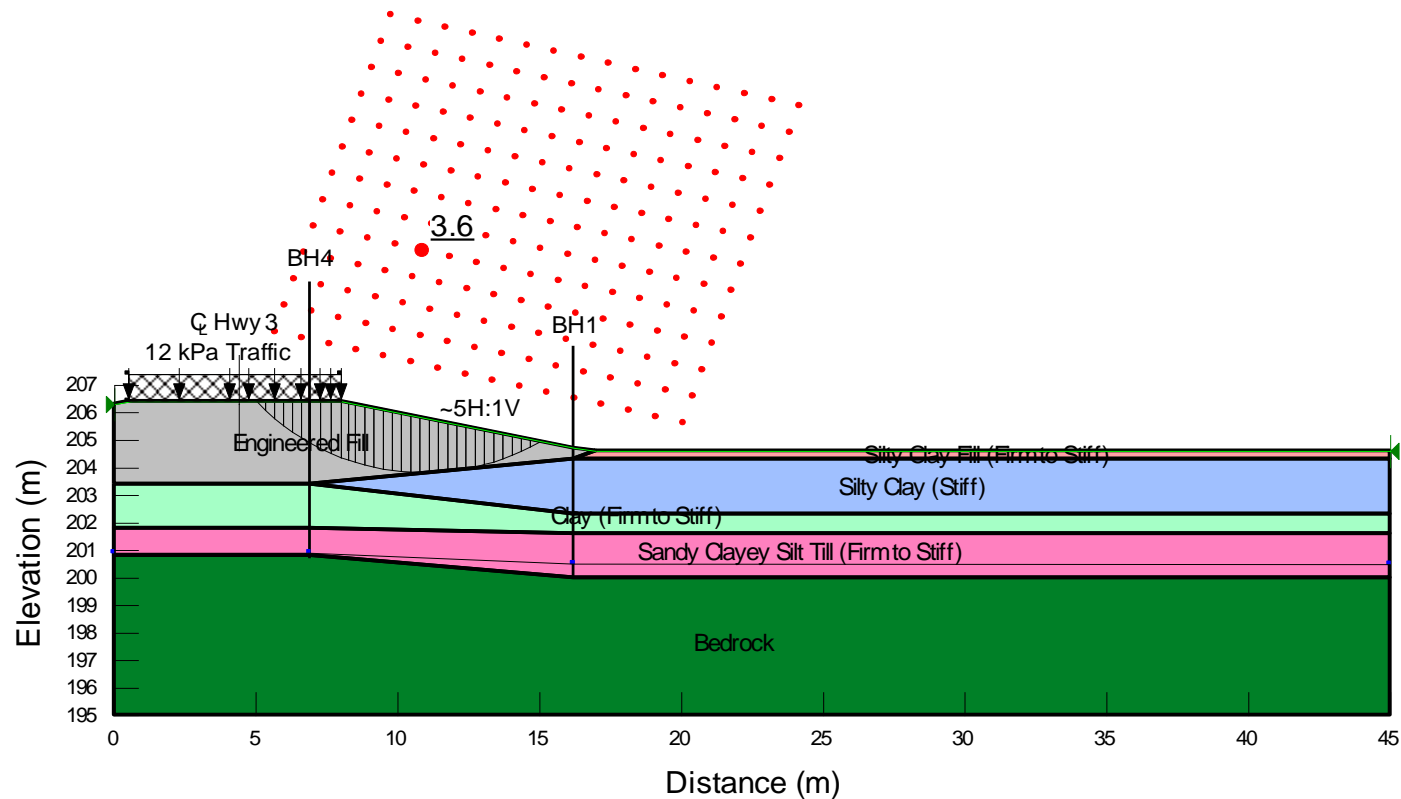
Slope stability analysis for embankment slope after culvert replacement – undrained static conditions
